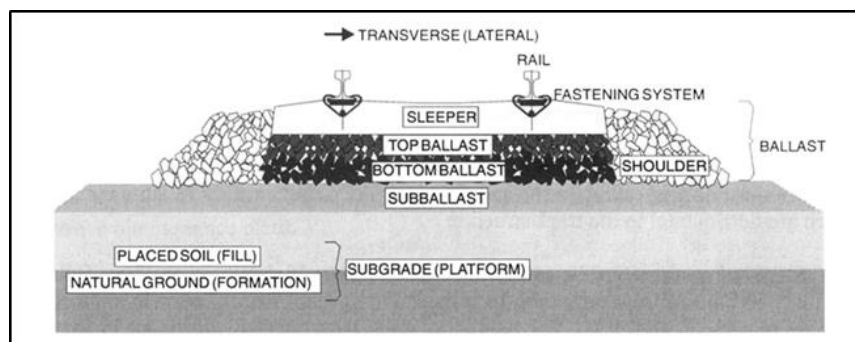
Cross Section View of Typical Ballast Track (Alabbasi and Hussein., 2019)
